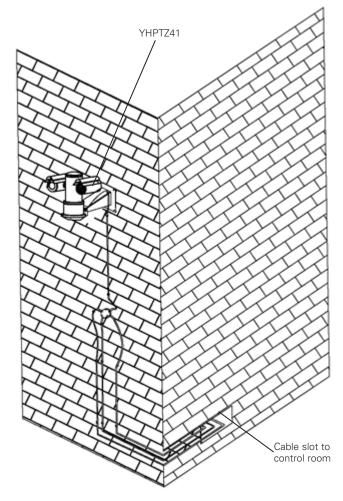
YHPTZ41(Ex) support installation
